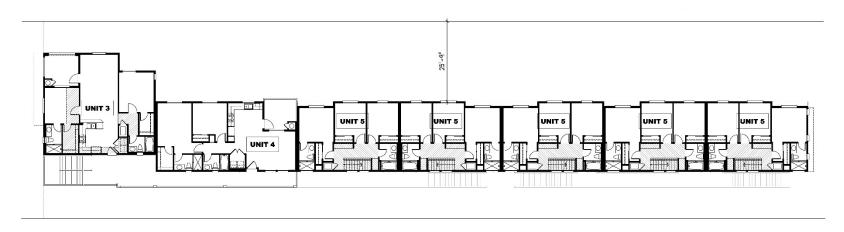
Building Floor Plan: 2nd & 3rd Floors
